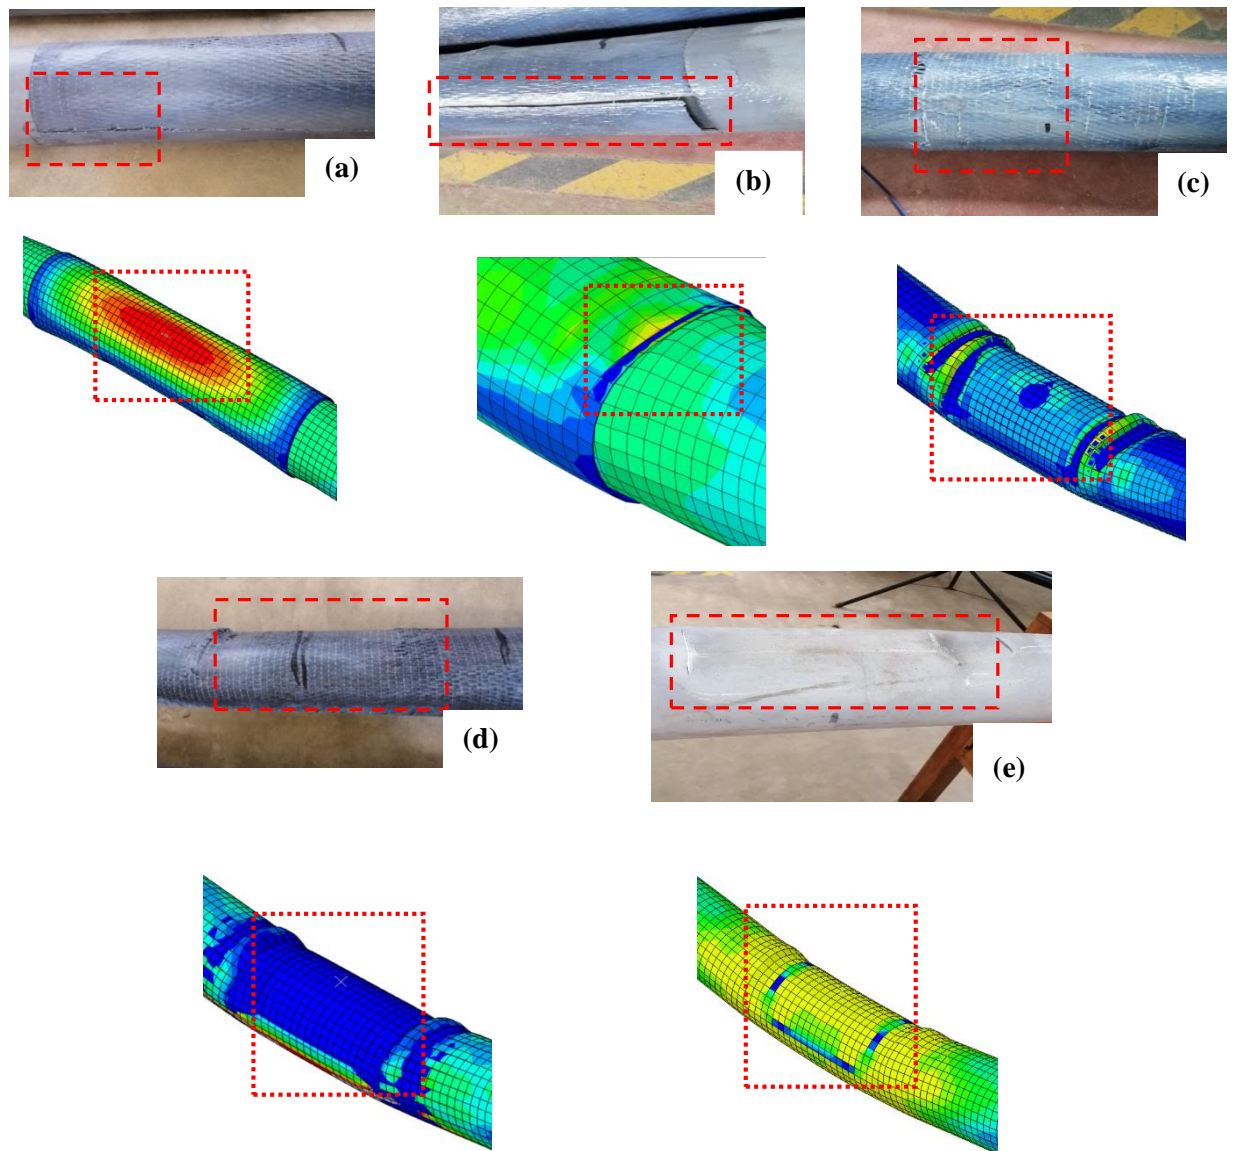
Failure modes obtained through numerical modelling (a) CFRP rapture at the bottom side of loading point(b) CFRP crushing at the loading points (c) edge debonding, (d) Bearing of steel beam at the loading point
